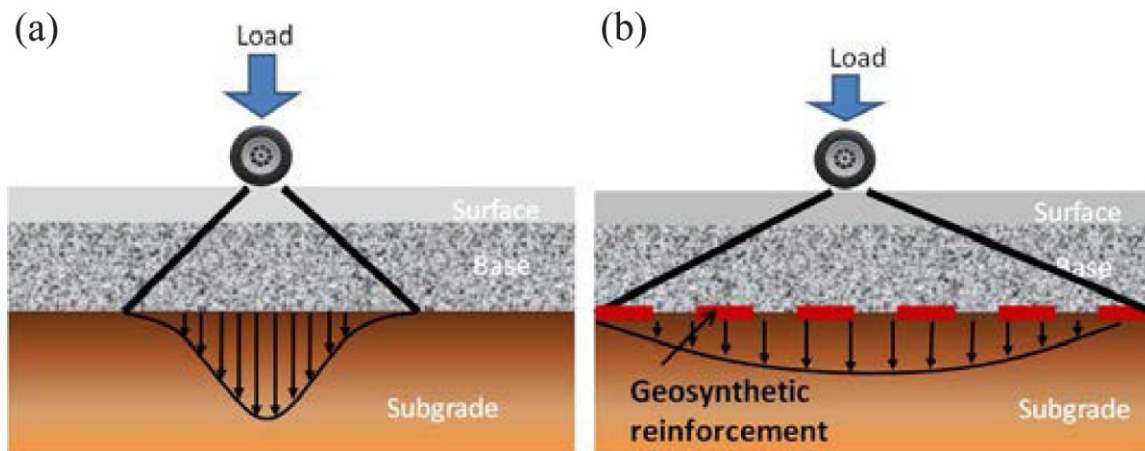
Load distribution mechanisms of (a) unreinforced pavement and (b) reinforced pavement (Zornberg 2012)
